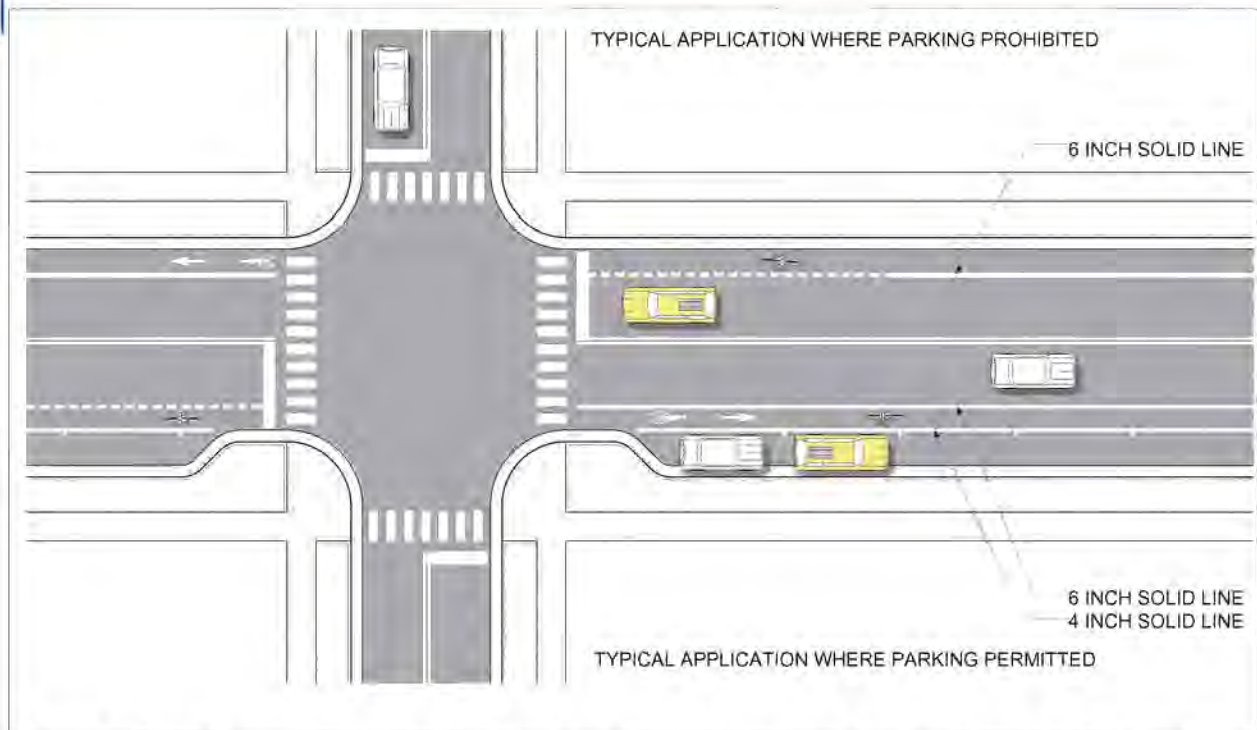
This figure shows typical bike lane details on streets with parking and without parking. Note that the curb extensions at the intersection do not extend into bike lanes.
